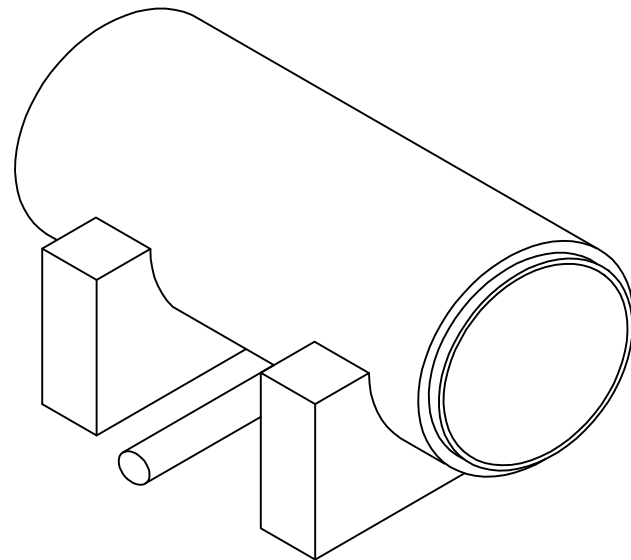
DETAIL FOR COMPUTING ROUND INLET ELEVATIONS
